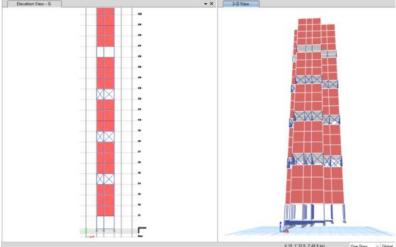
Elevation & 3D view of the building with bracings at 4th+8th+12th floors on 5° sloping ground
